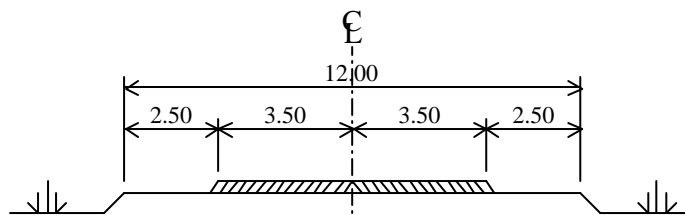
Typical Cross-section of NRs in Suburban Area
